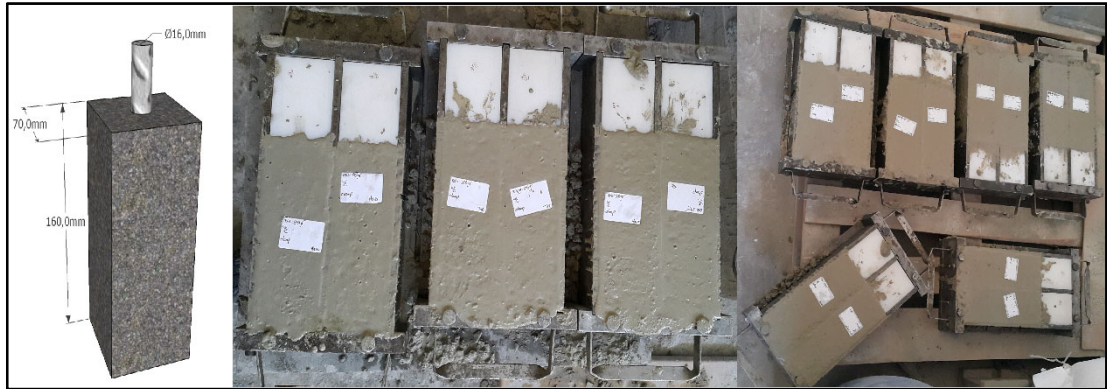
Concrete specimens detail and casting (Personal archive, 2016)
